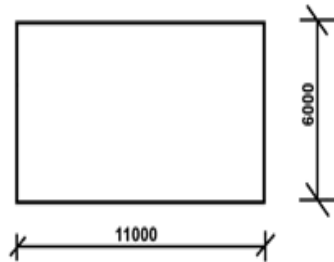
Plan of a Rectangle – Scale 1:200
